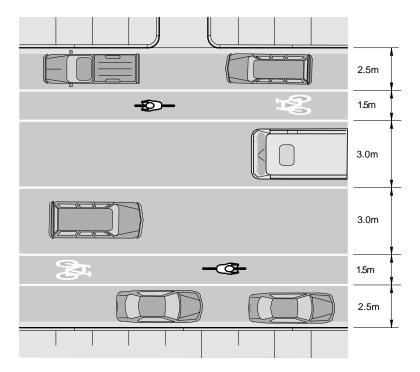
Kerr Street, proposed Lane Configuration, E 49th Ave. to E 63rd Ave. (typical)
